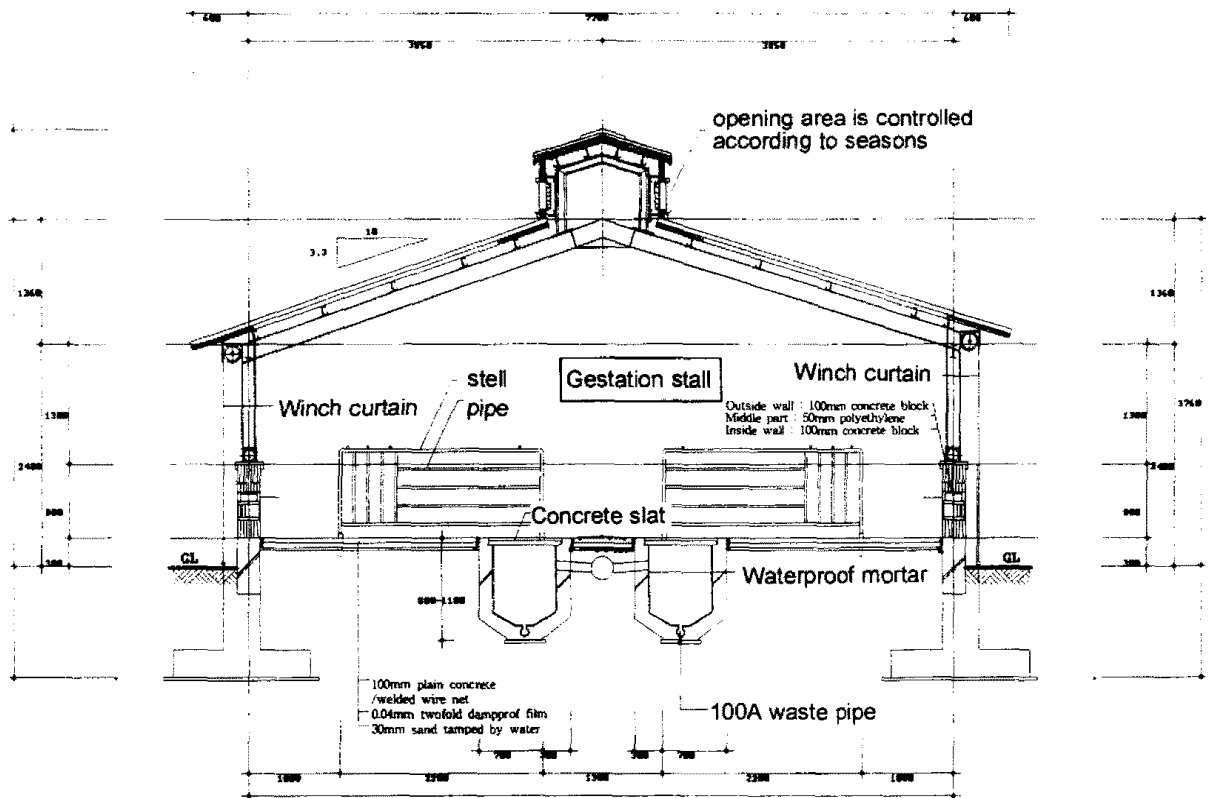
Cross-sectional view of a gestating building of MODEL- I .
